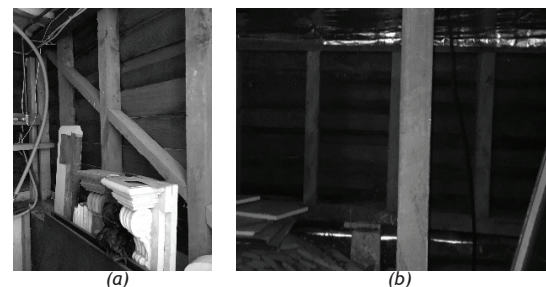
Example of Perimeter Walls at Foundation Level (a) with and (b) without Diagonal Bracing.
